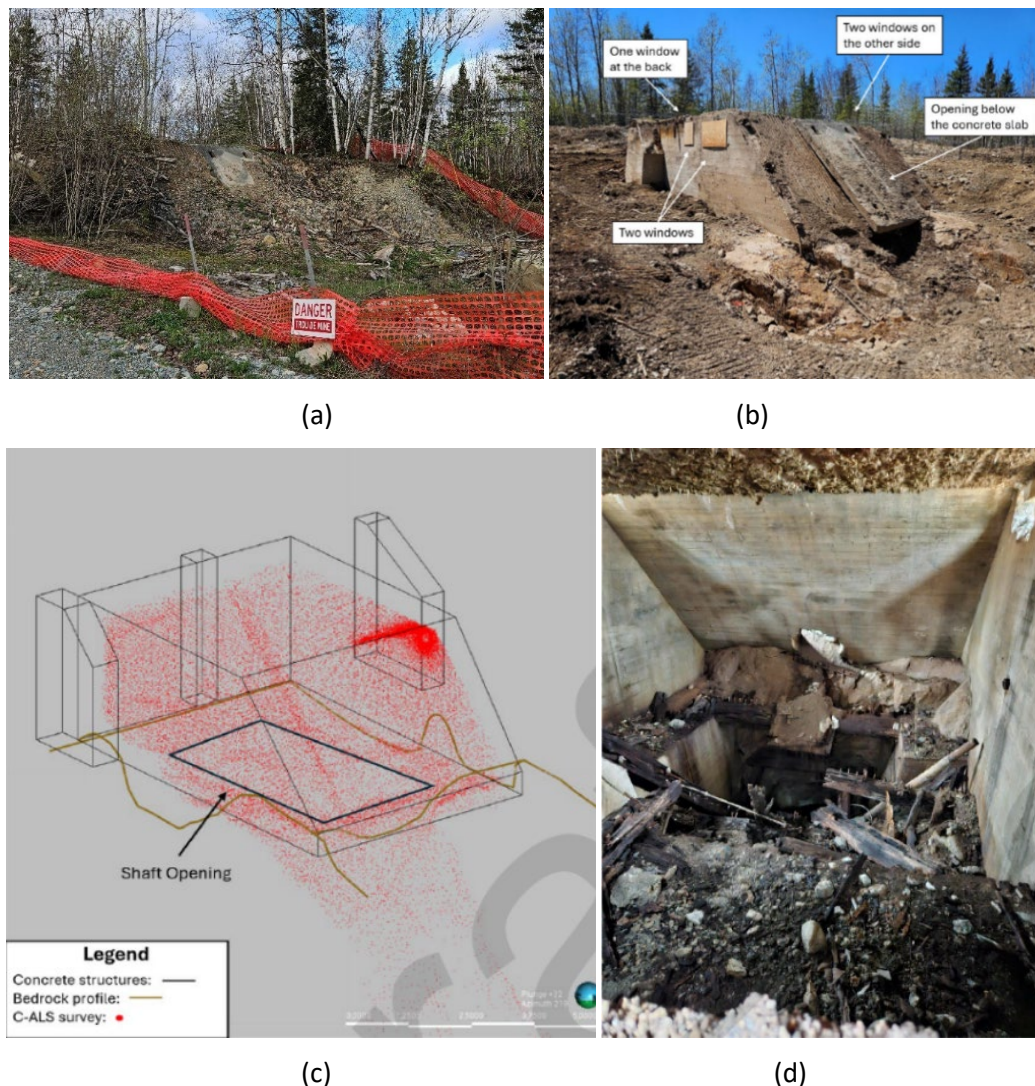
(a) Shaft #3 before excavation; (b) Shaft #3 after excavation exposing the concrete structure; (c) C-ALS surveys of Shaft #3 looking west and bedrock profile; (d) Inside of the concrete structure of Shaft #3
